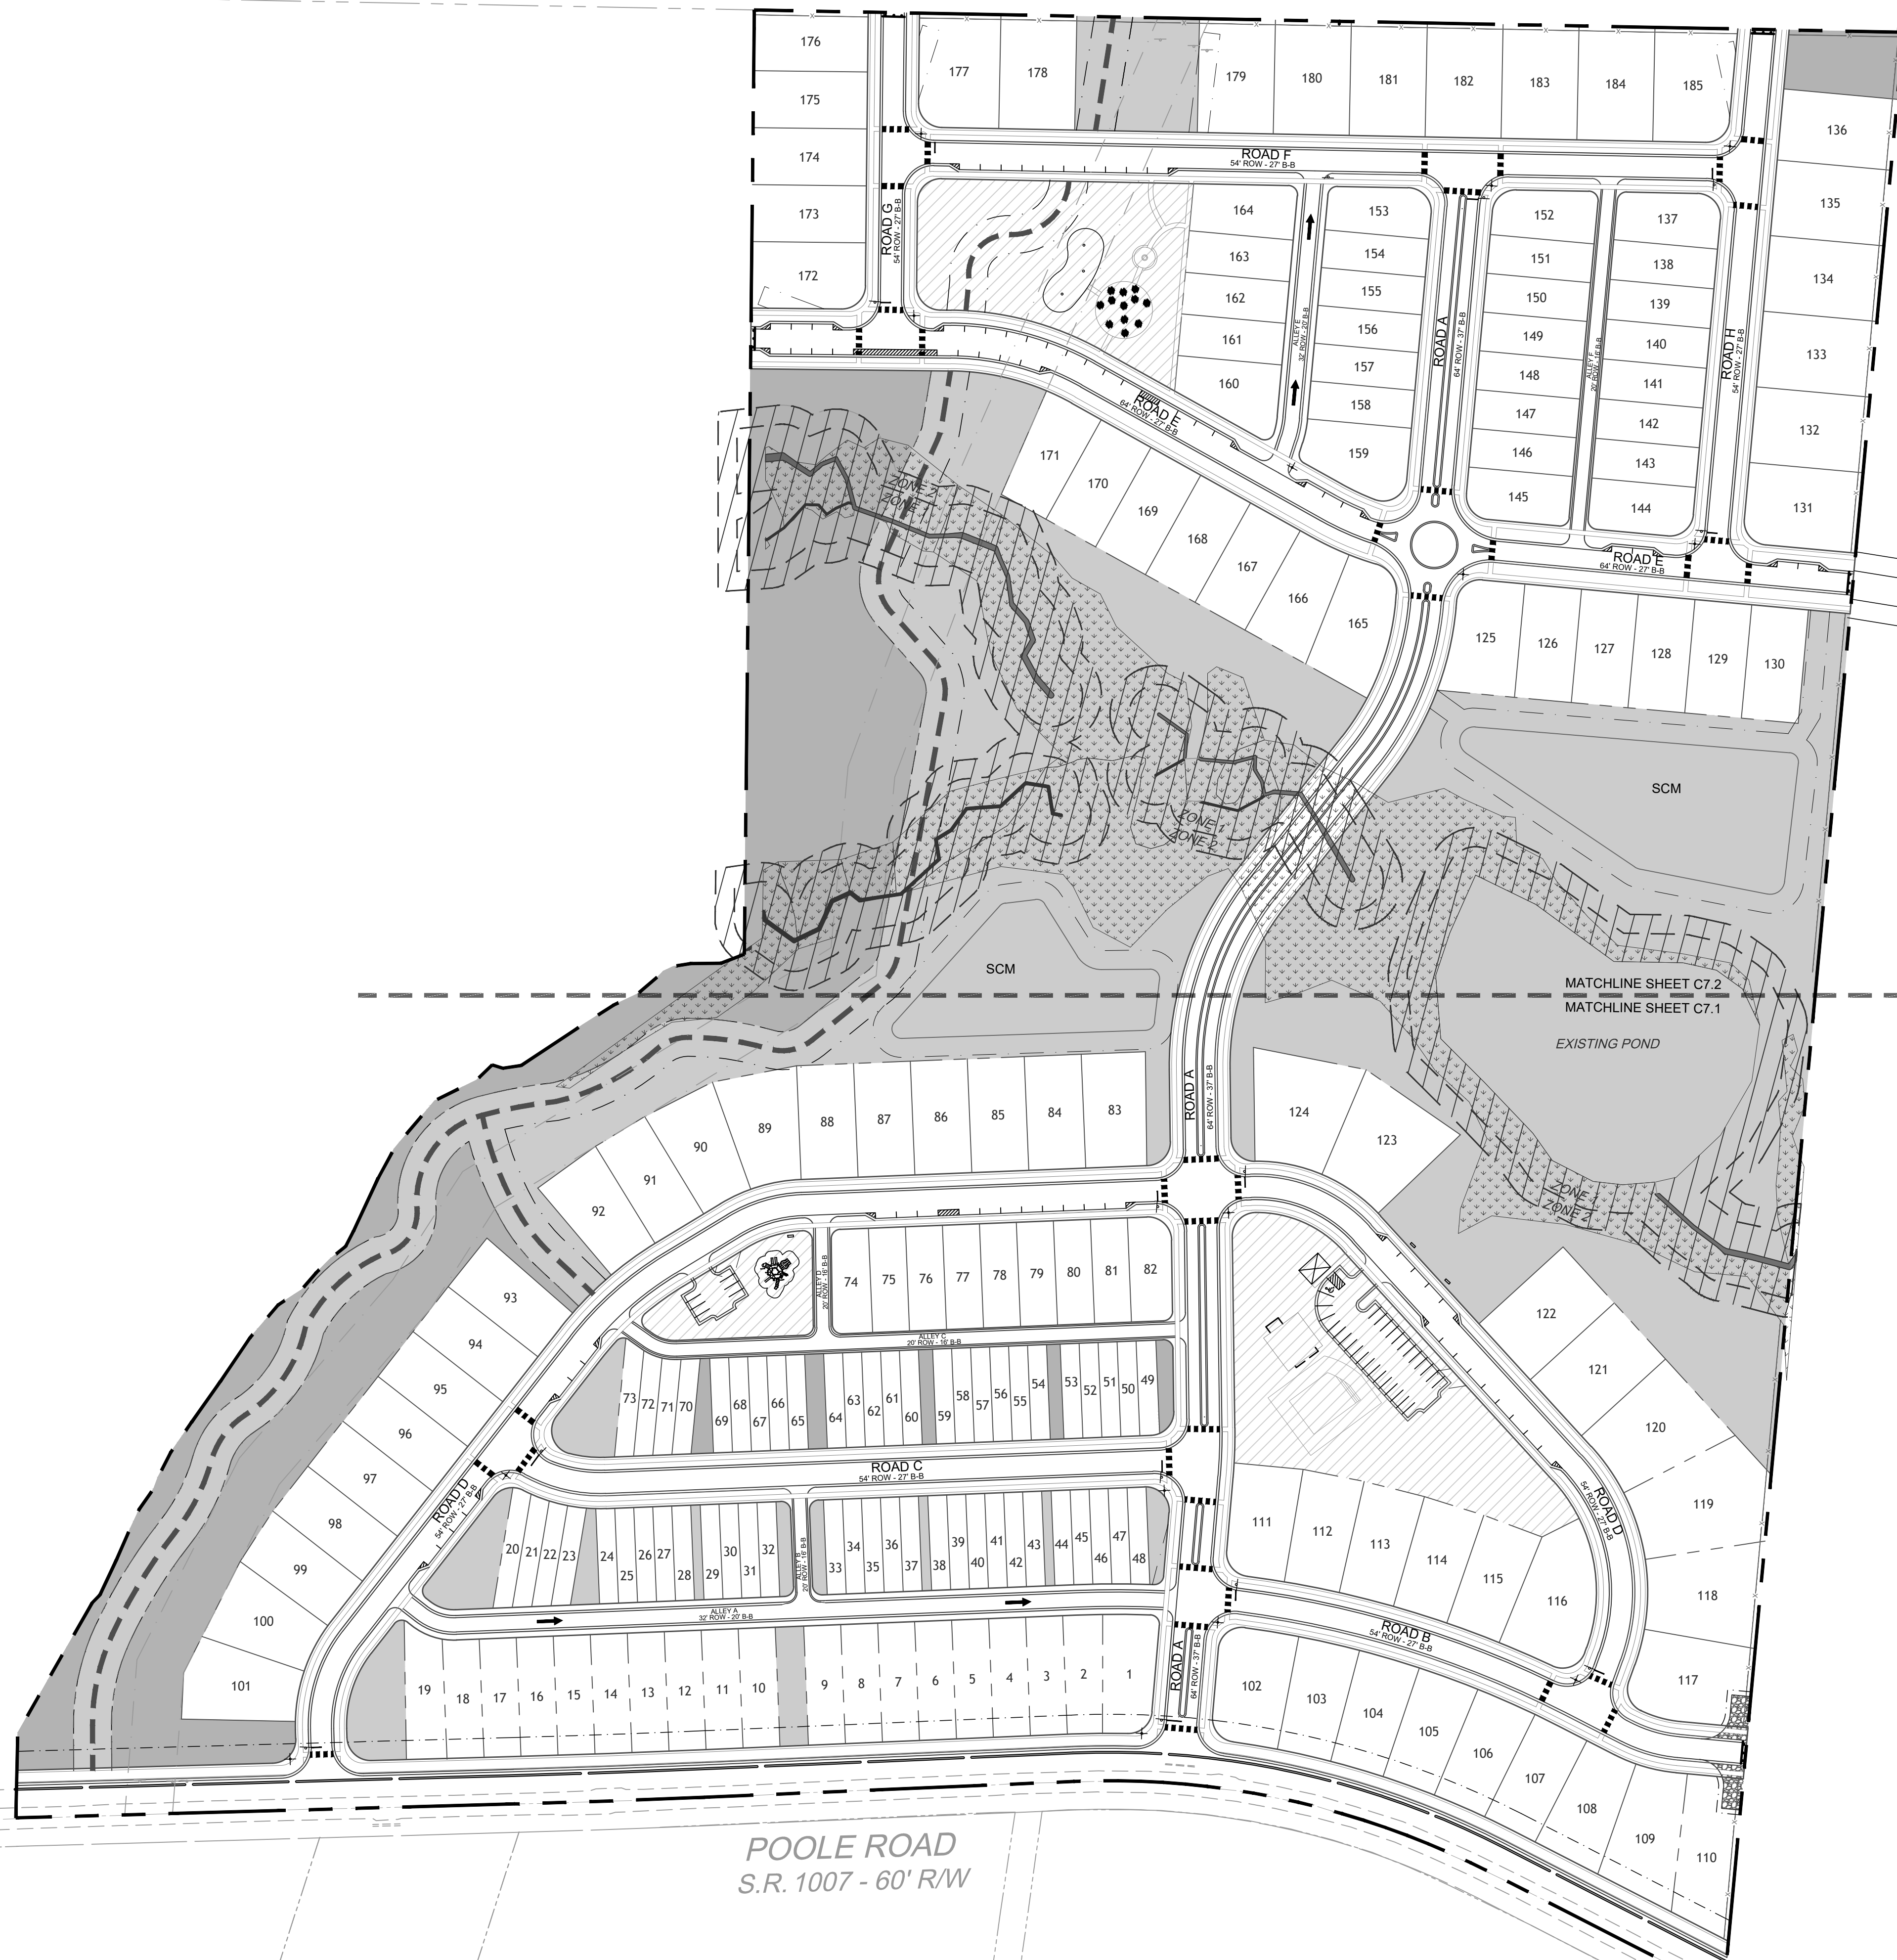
DETAILED LANDSCAPE PLAN SHEET 2 OF 2
